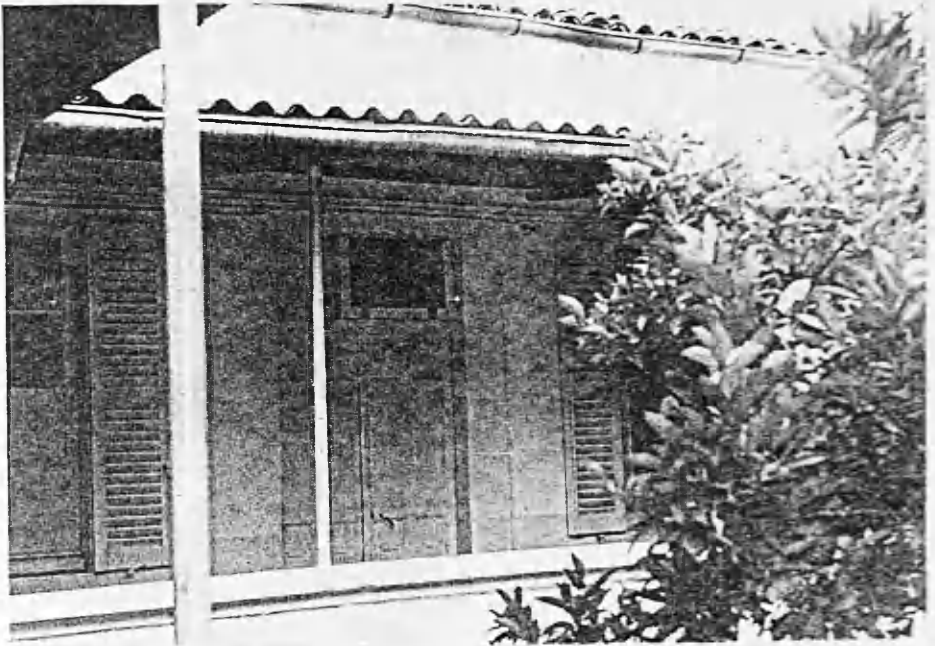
Upper floor gallery: the upper part of the door (room 2:3) has been adapted to accommodate an air conditioning unit.
